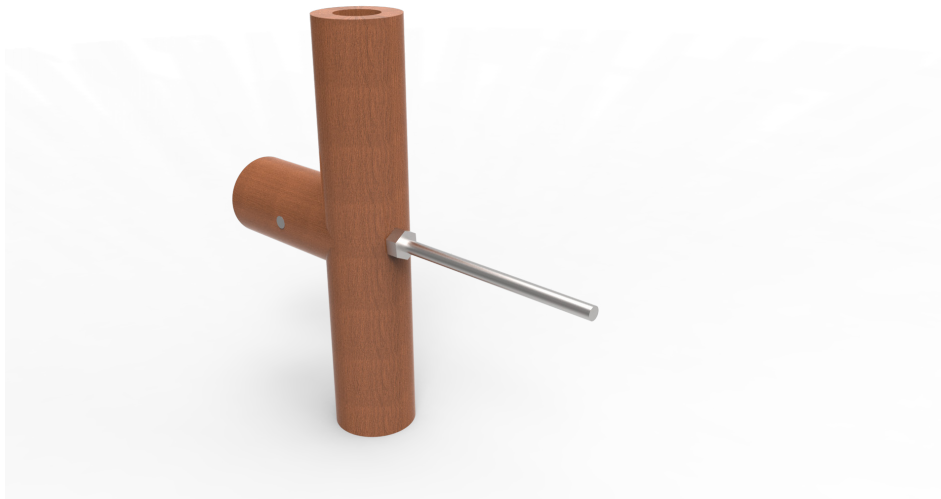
The bamboo parts connected with the metal joint mechanism
